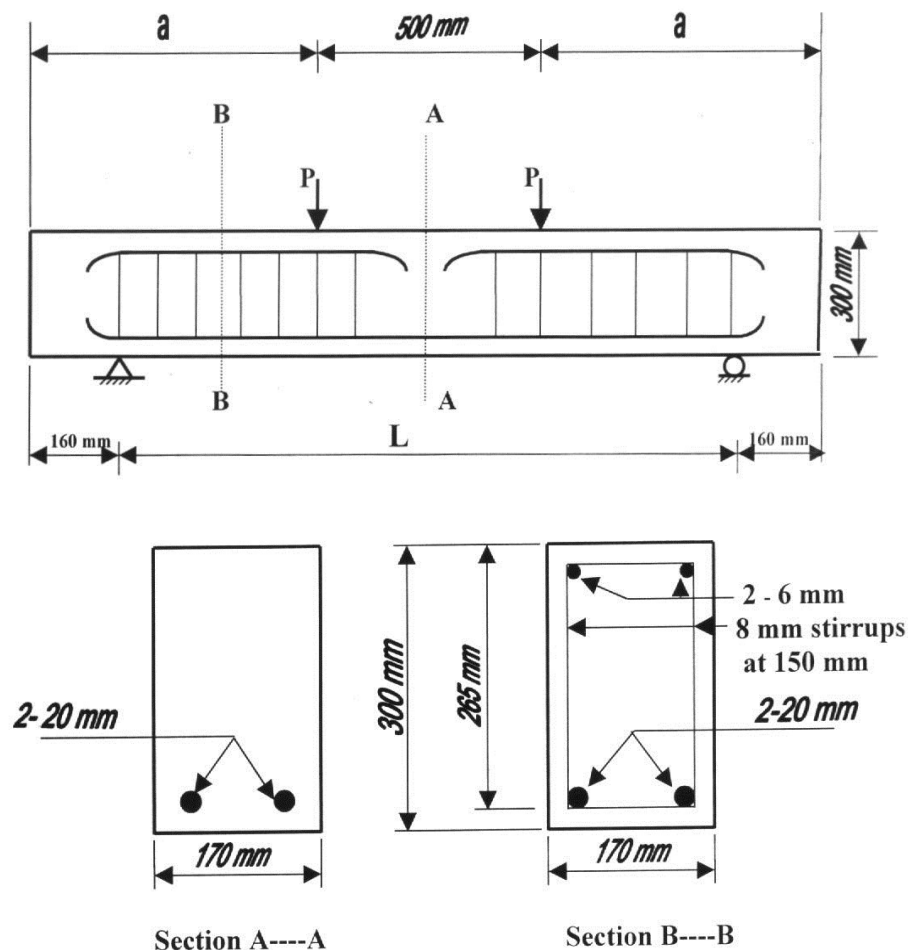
Dimensions and reinforcement details for Ashour and Wafa beams.
